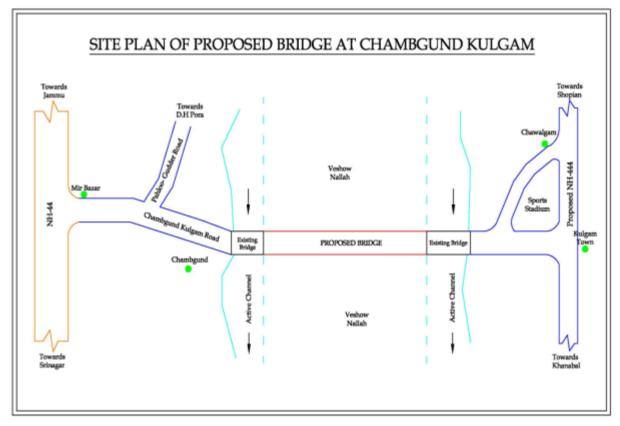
Site Plan of the proposed bridge at Chambgund, Kulgam
